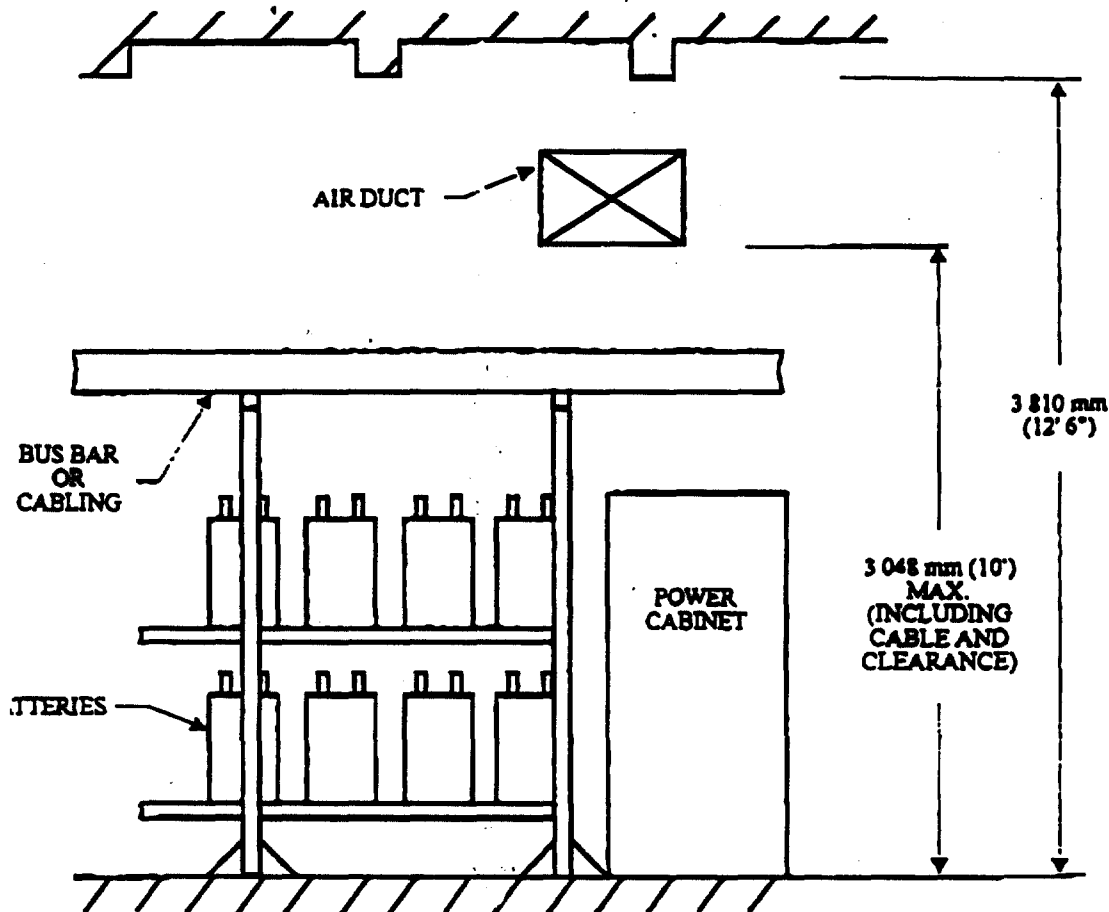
Typical Network DC Centralized Power Plant Equipment Area
